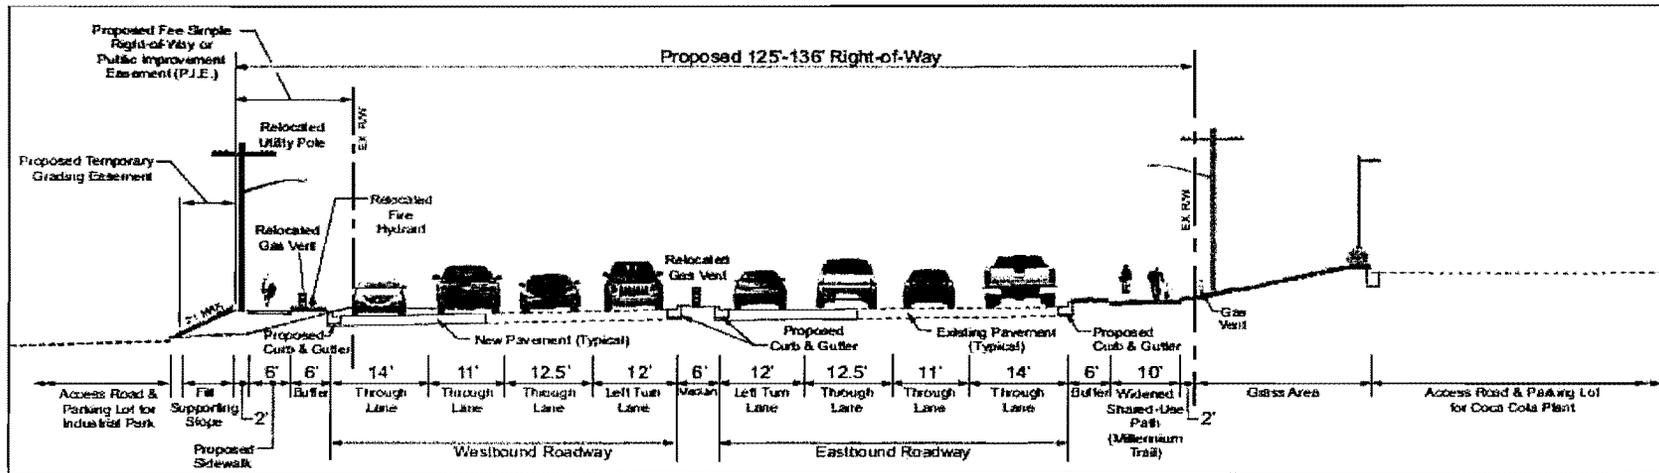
Alternative 3: Enhanced Master Plan, Recommended Alternative. Proposed typical roadway along East Gude Drive at Section C-C, approximately 250' west of Dover Road.
